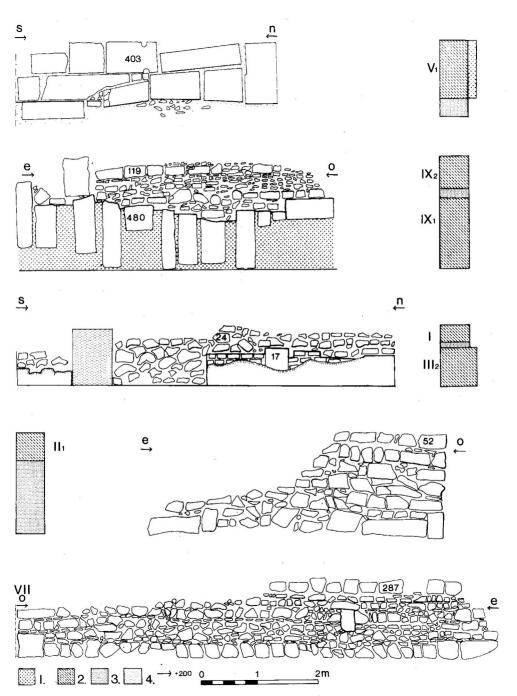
Construction techniques: 1. Pisé; 2 socle; 3. foundation; 4. French wall.
